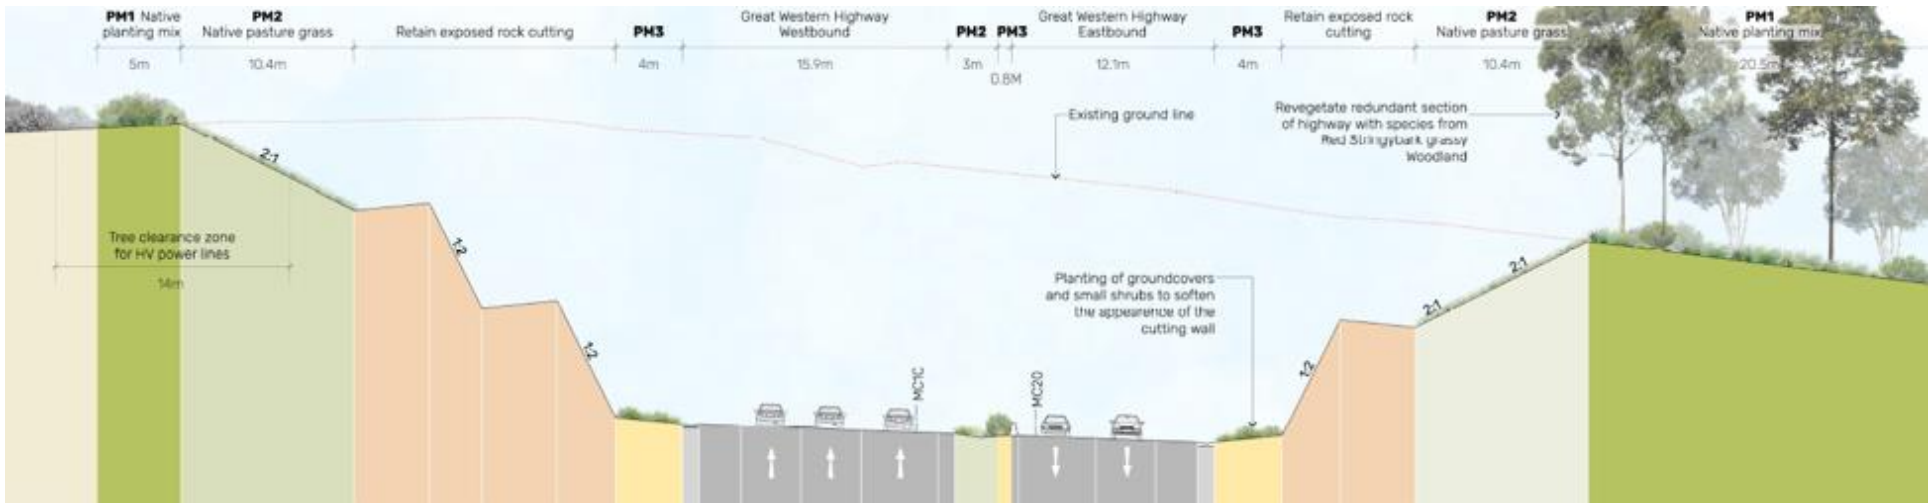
d Typical cross section of Great Western Highway requiring deep cut
